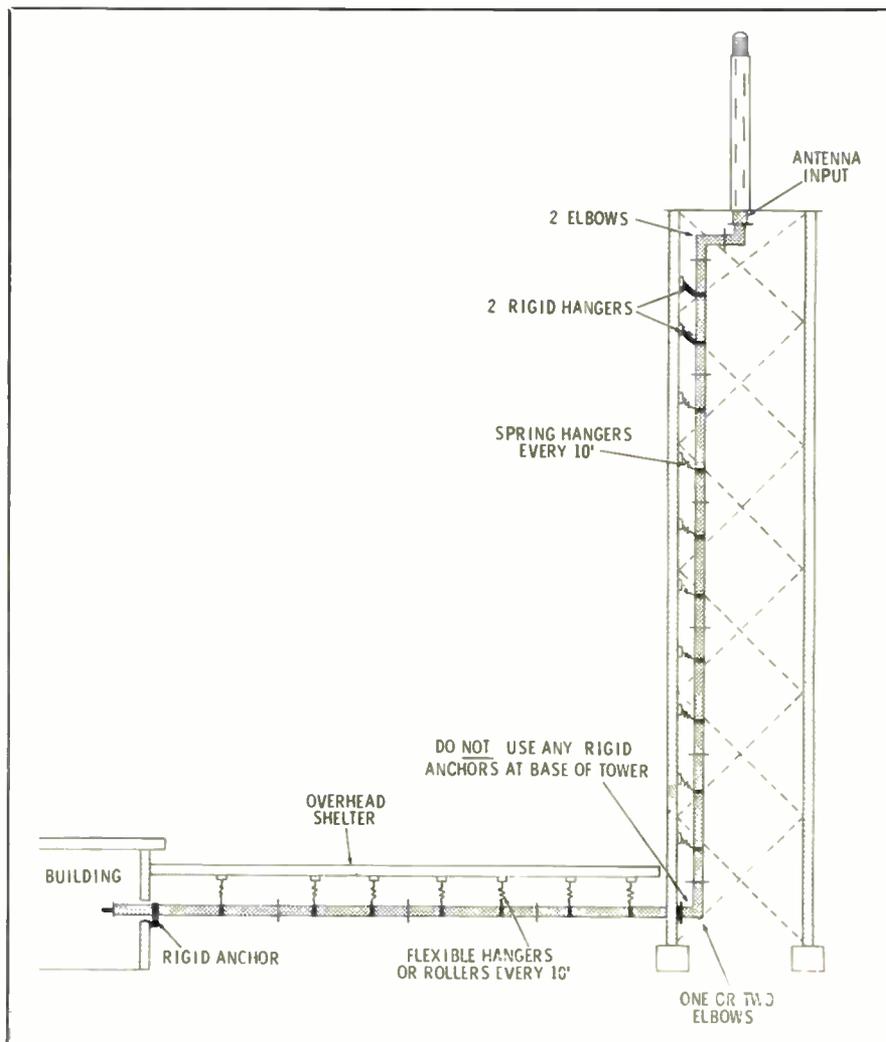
Sketch shows installation details of a typical coaxial transmission-line run.
